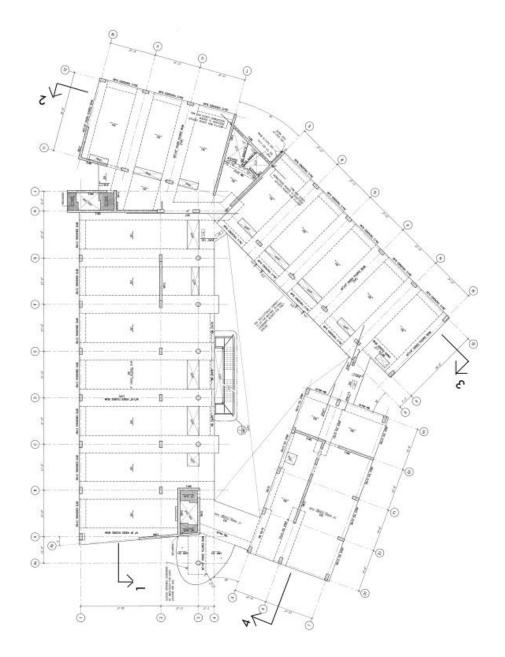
Typical Floor plan, taken from \$202. See following figures for sections indicated on the plan.
